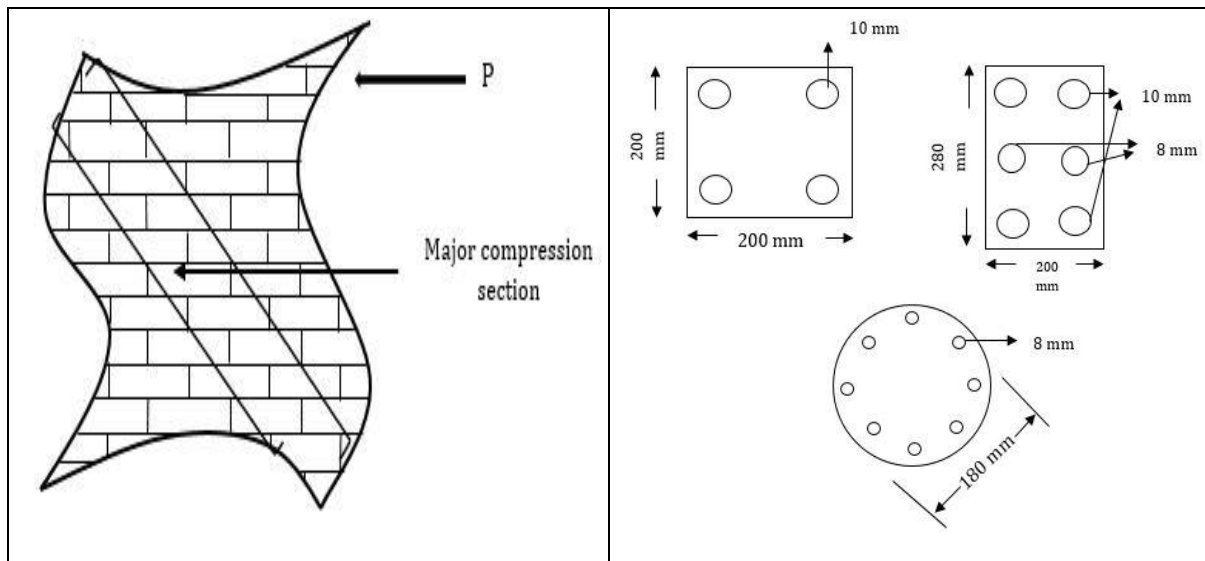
(a) Deformed shape of brick infill under compression in both directions and (b) cross sectional area of square, rectangular and circular column.
